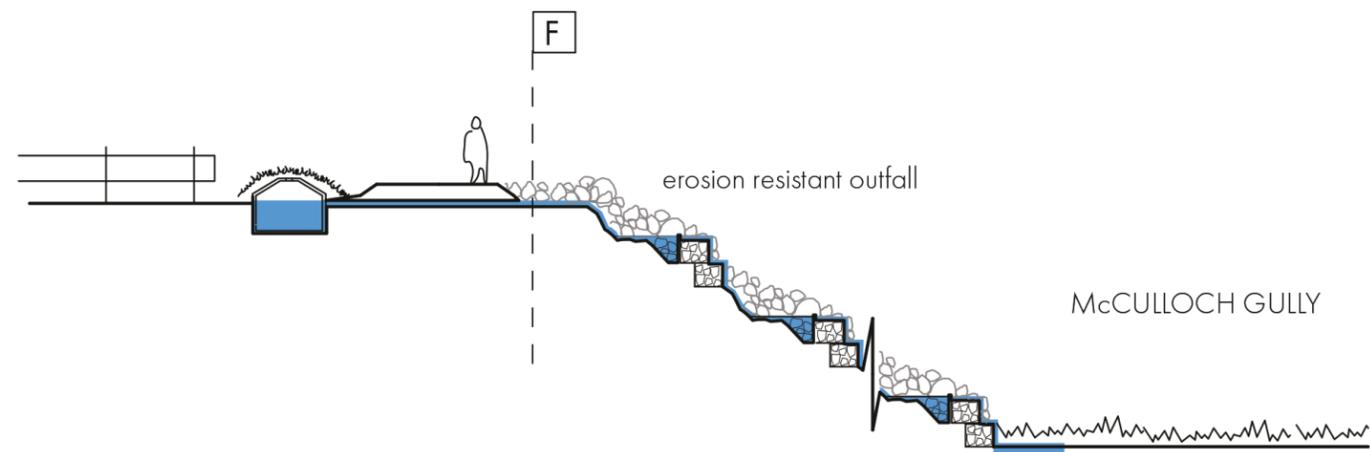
1:100 WATERCOURSE SECTION DETAIL 04
